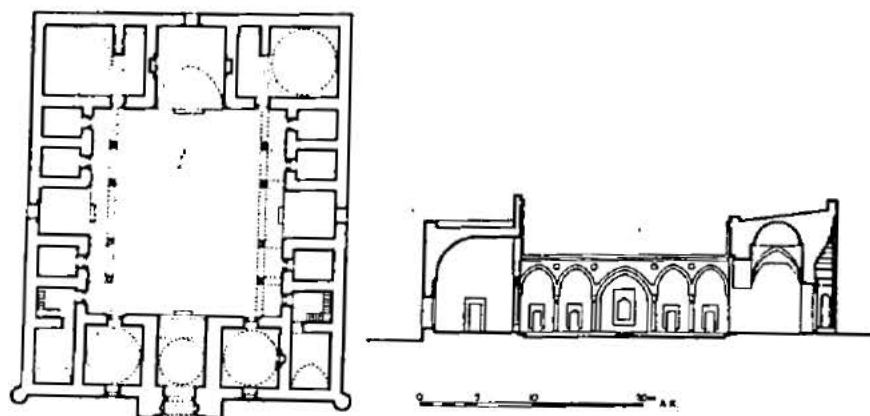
Burciye Madrasa, Sivas - Plan and elevation
